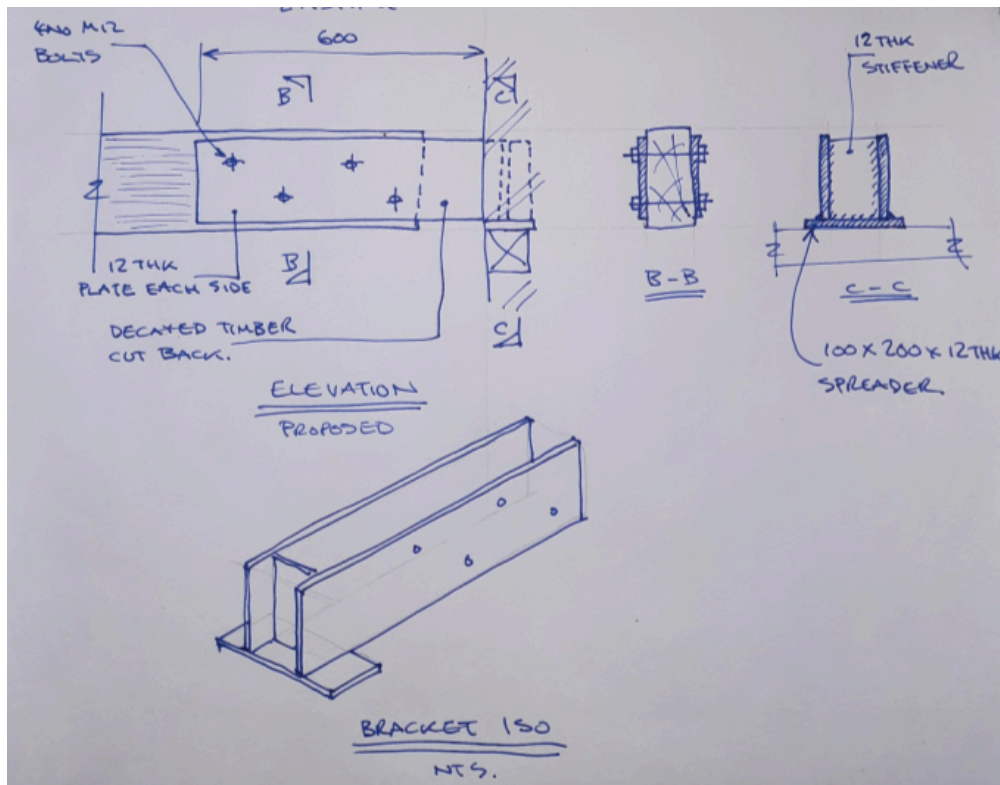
The Morton Partnership: design for steel bearing plates to replace decayed timber into existing masonry wall.
